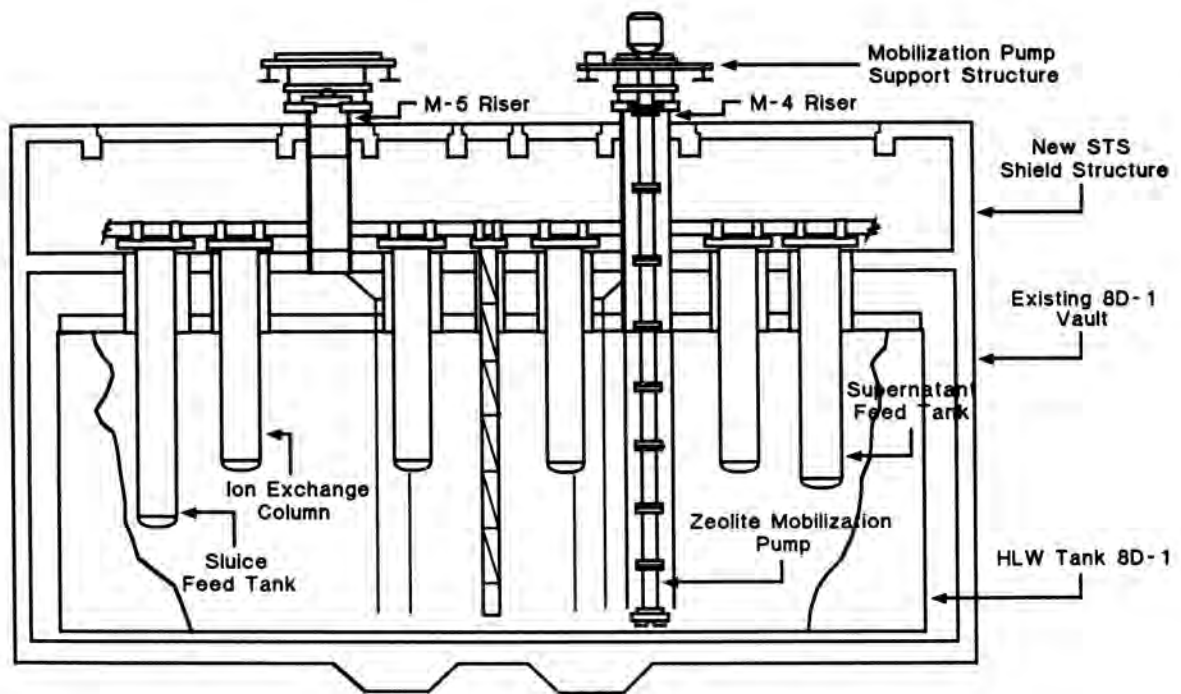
Elevation View of Supernatant Treatment System Installation in Underground Tank 8D-1
